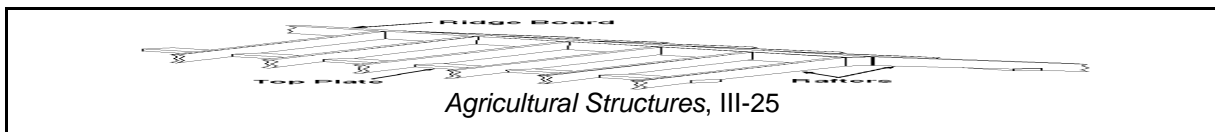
, rafters are part of a truss system, and a "trussed rafter" is the correct term for a truss.
